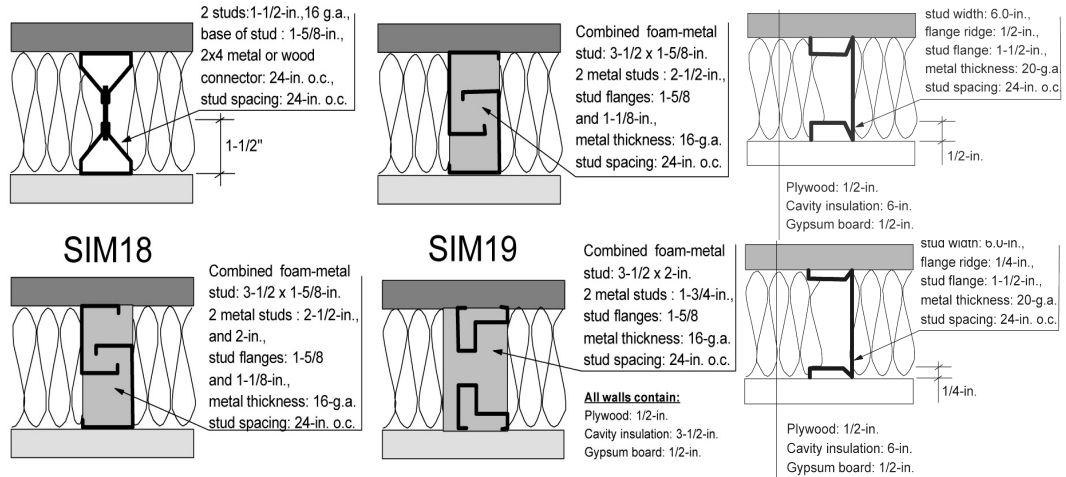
Light Gauge Steel Studs Designed to Reduce Thermal Bridging
